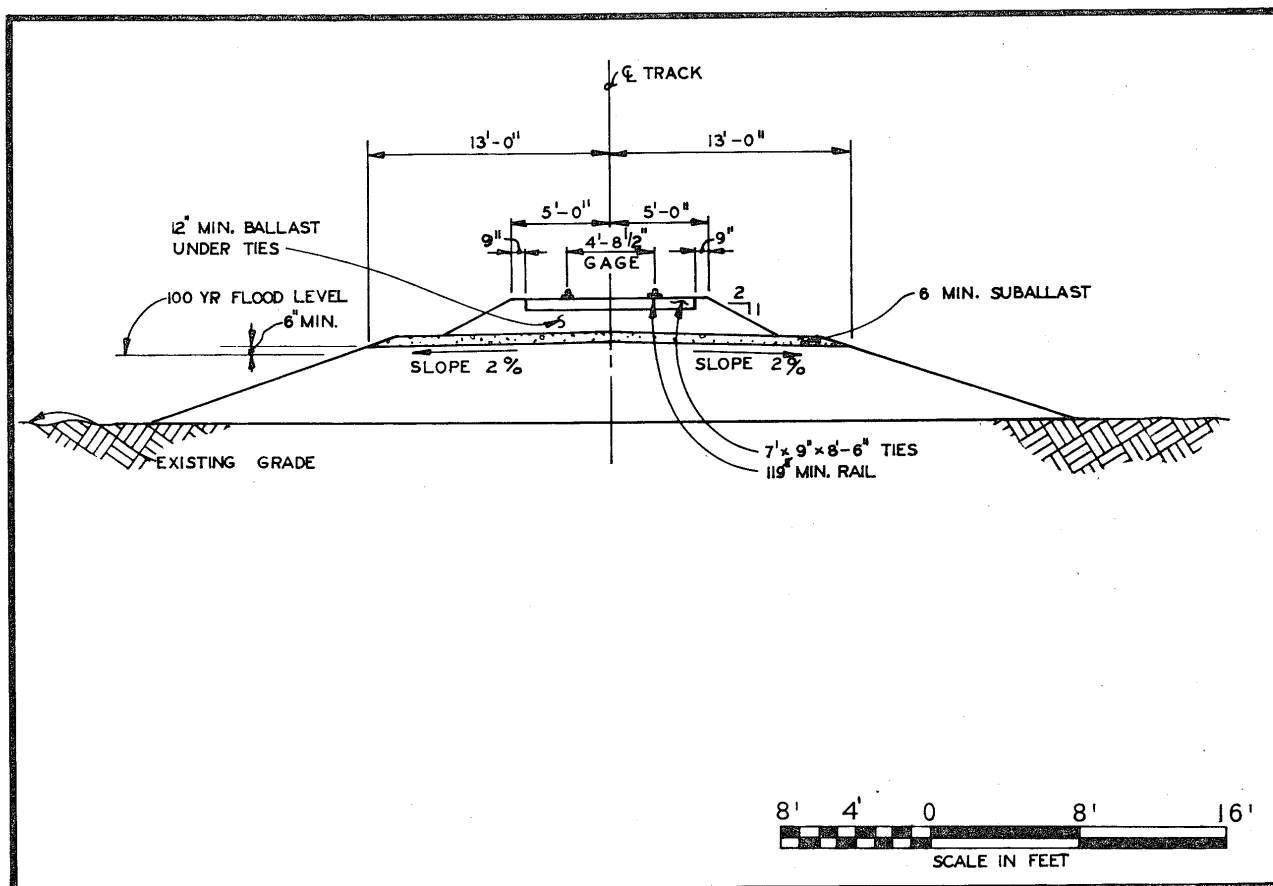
TYPICAL RAILROAD SECTION
